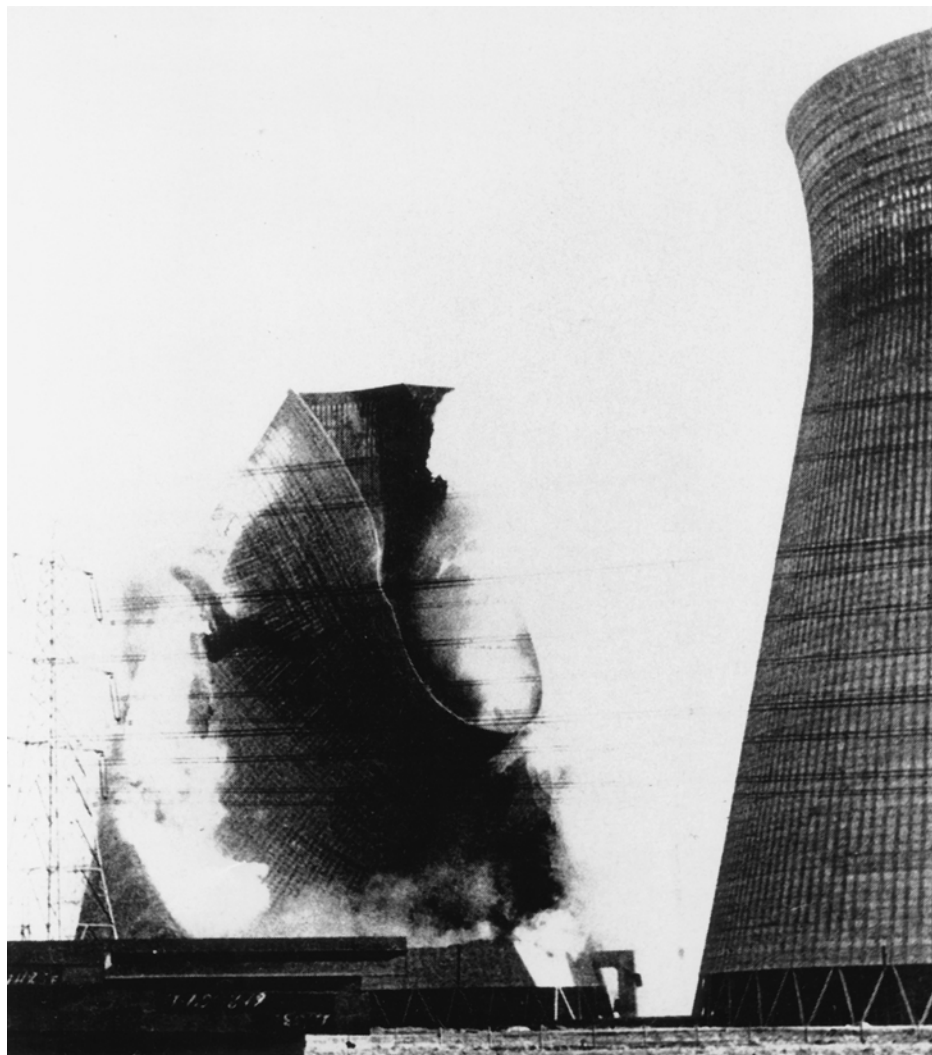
Ferrybridge Cooling Tower failures, 1965.
